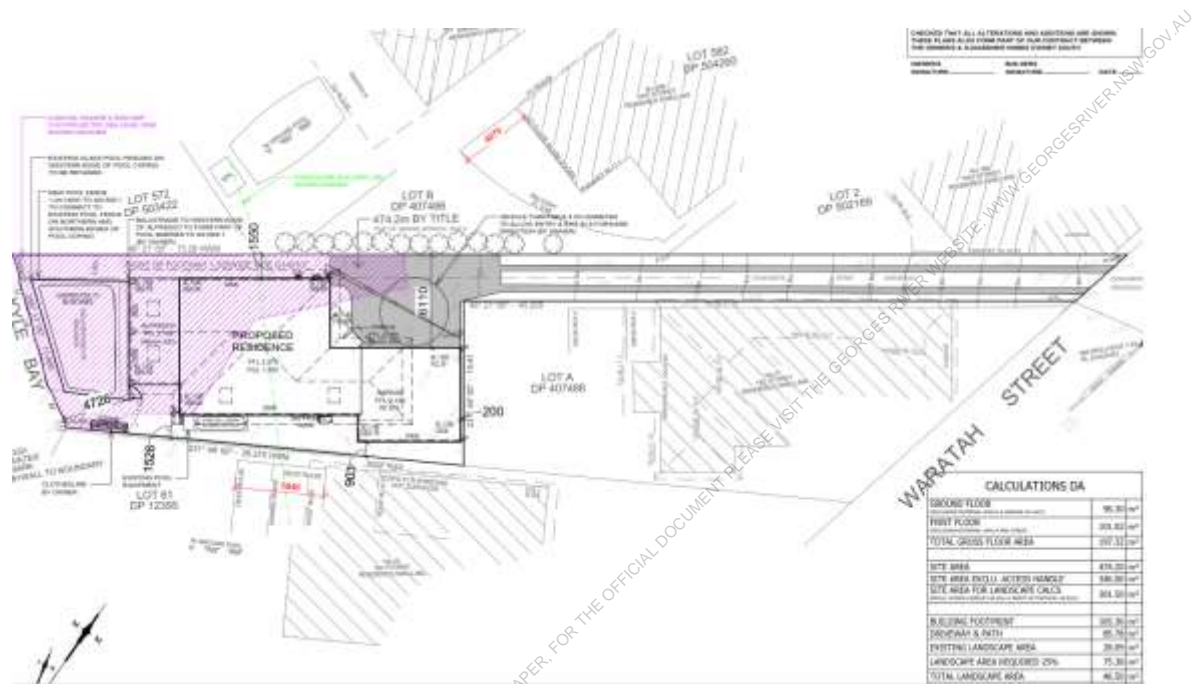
Site Plan (Source: G.J. Gardner Homes Sydney South)
